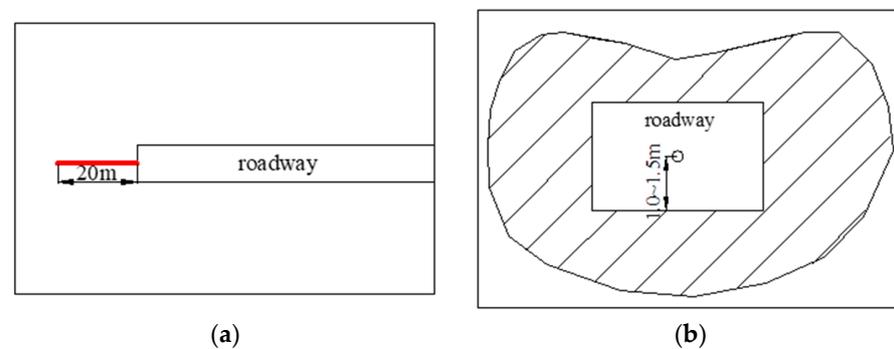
Plan and section of the pressure relief borehole in roadway excavation stage of No.11302 Panel. (a) Plan. (b) Section.
